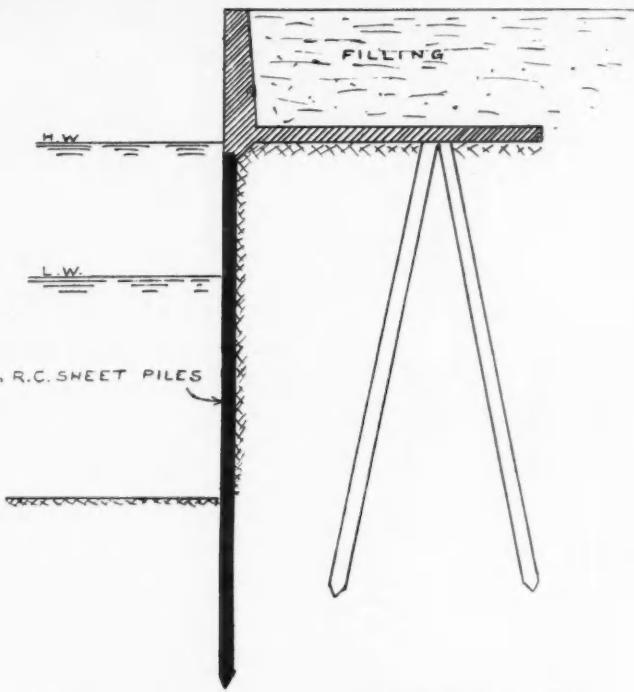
Wharf wall of reinforced concrete and reinforced concrete sheet piles.
